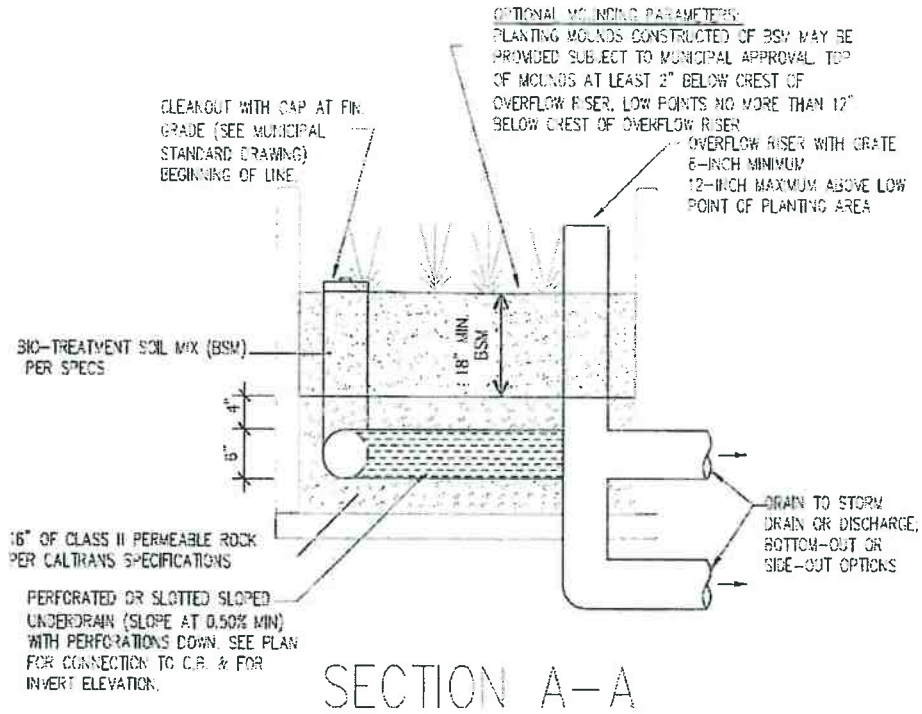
Cross section A-A of flow-through planter, shows side view of underdrain (Not to Scale)
